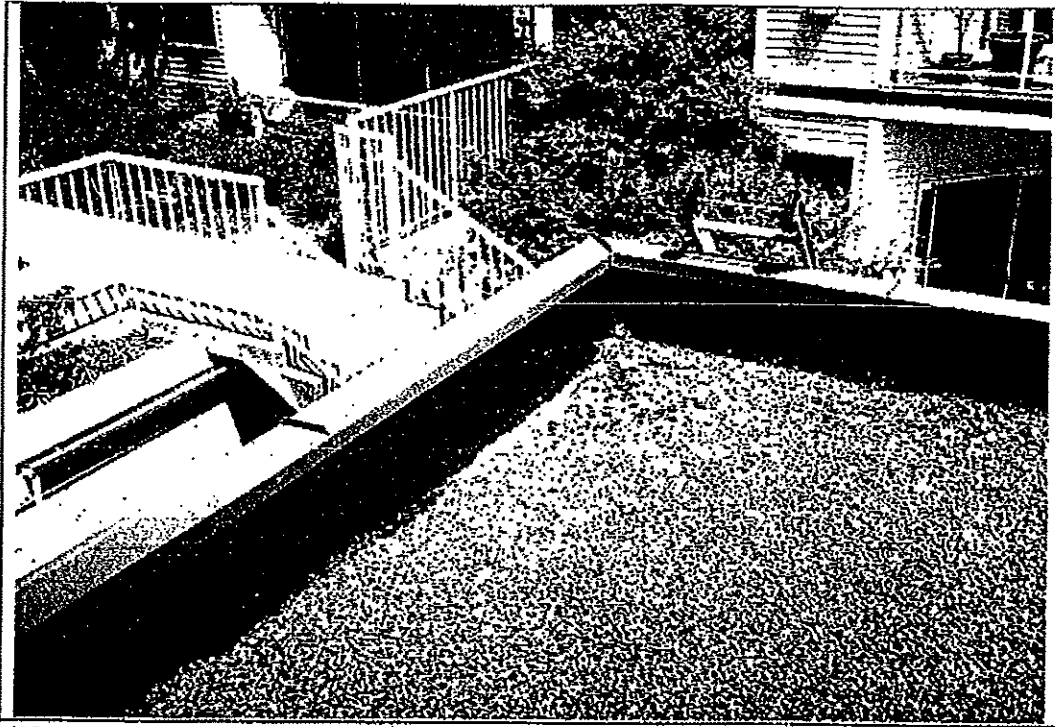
Parapet wall along the perimeter of a flat roof.
